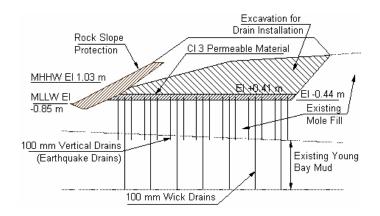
Typical cross section Bay Bridge, Oakland Touchdown.
